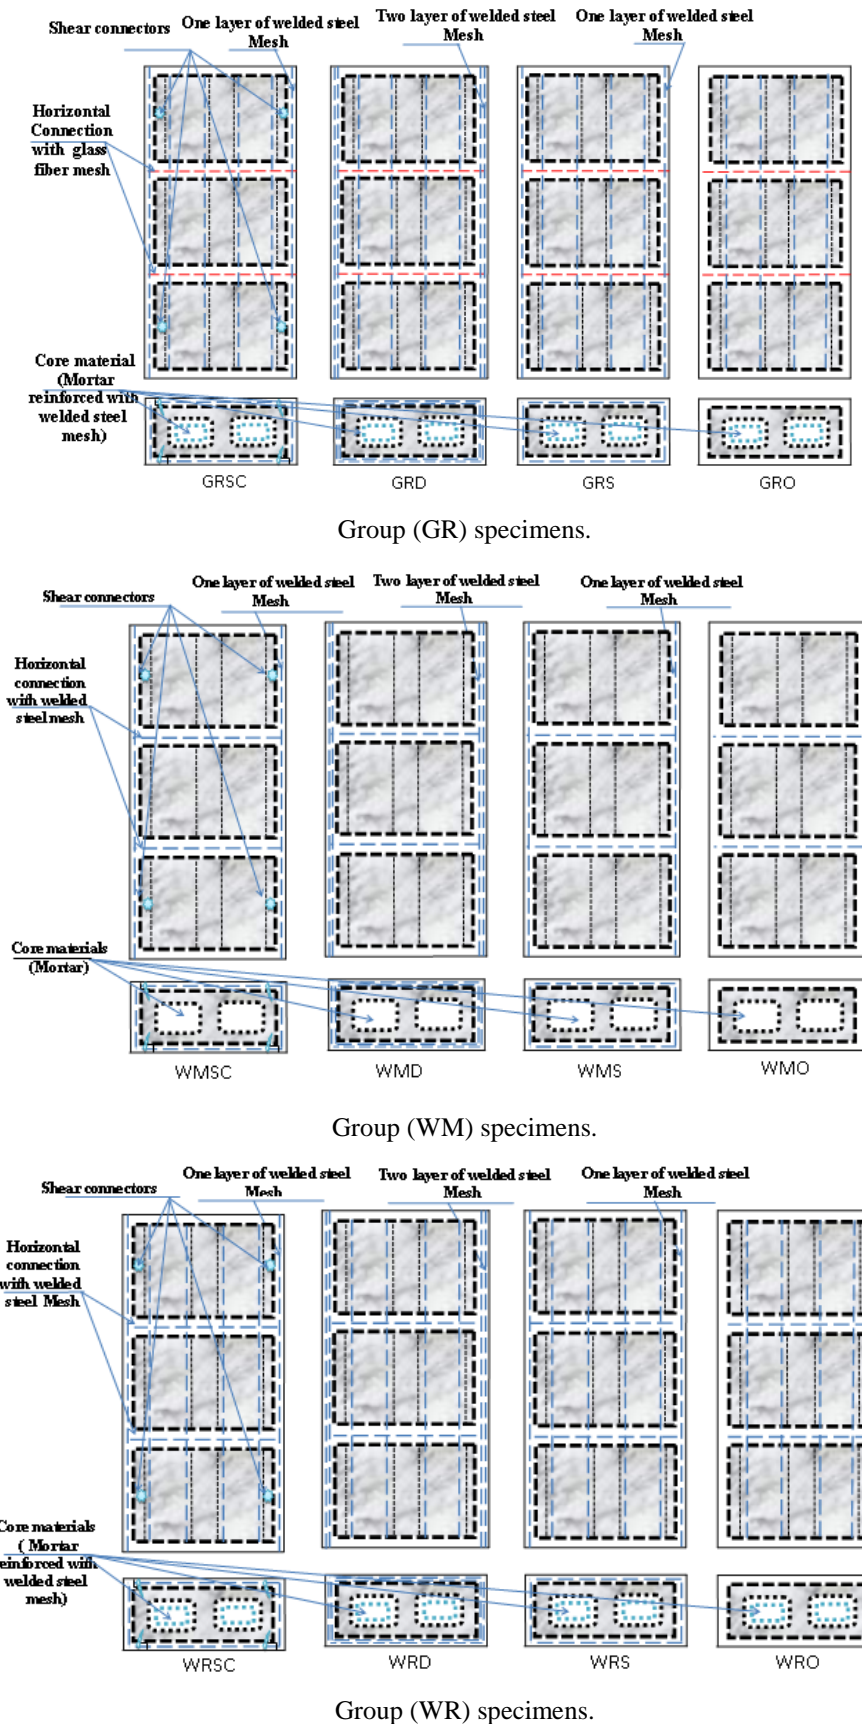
Details of Bonding Arrangement for Reinforced Masonry Columns Units.
